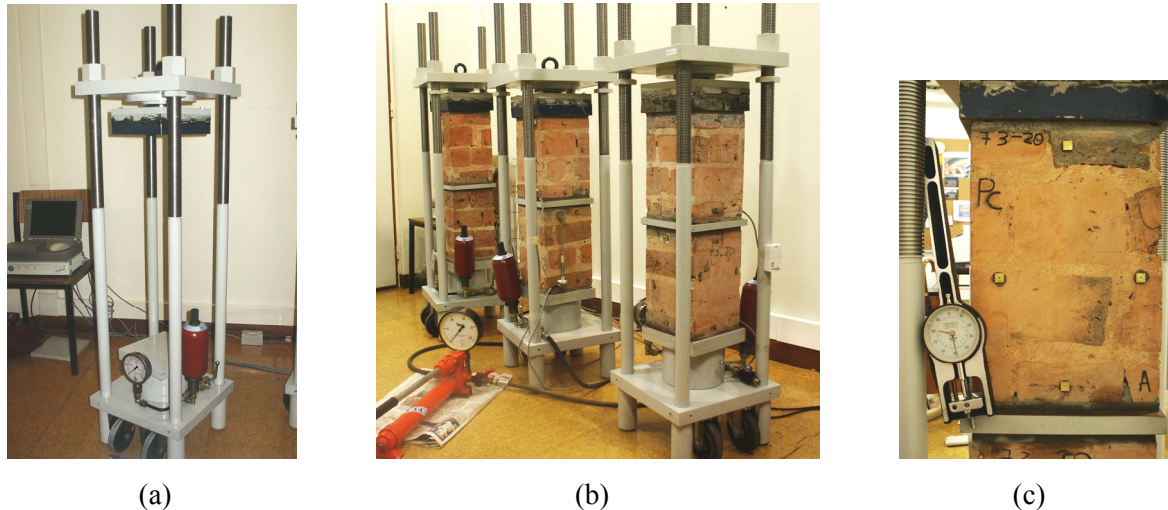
Testing apparatus: (a) hydraulic frame, (b) specimens under testing and (c) removable strain gauge and contact seats glued to the specimen.
